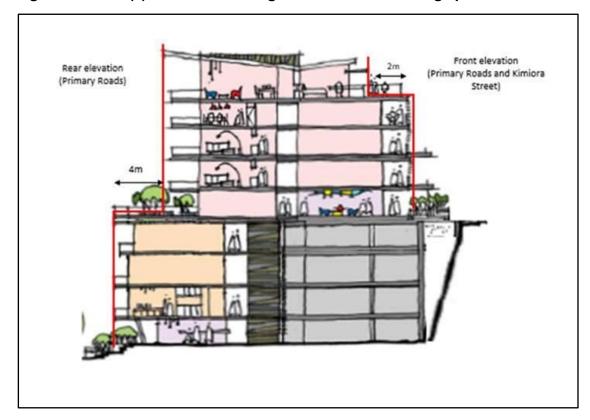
B(5) Minimum building setbacks for cascading apartments
